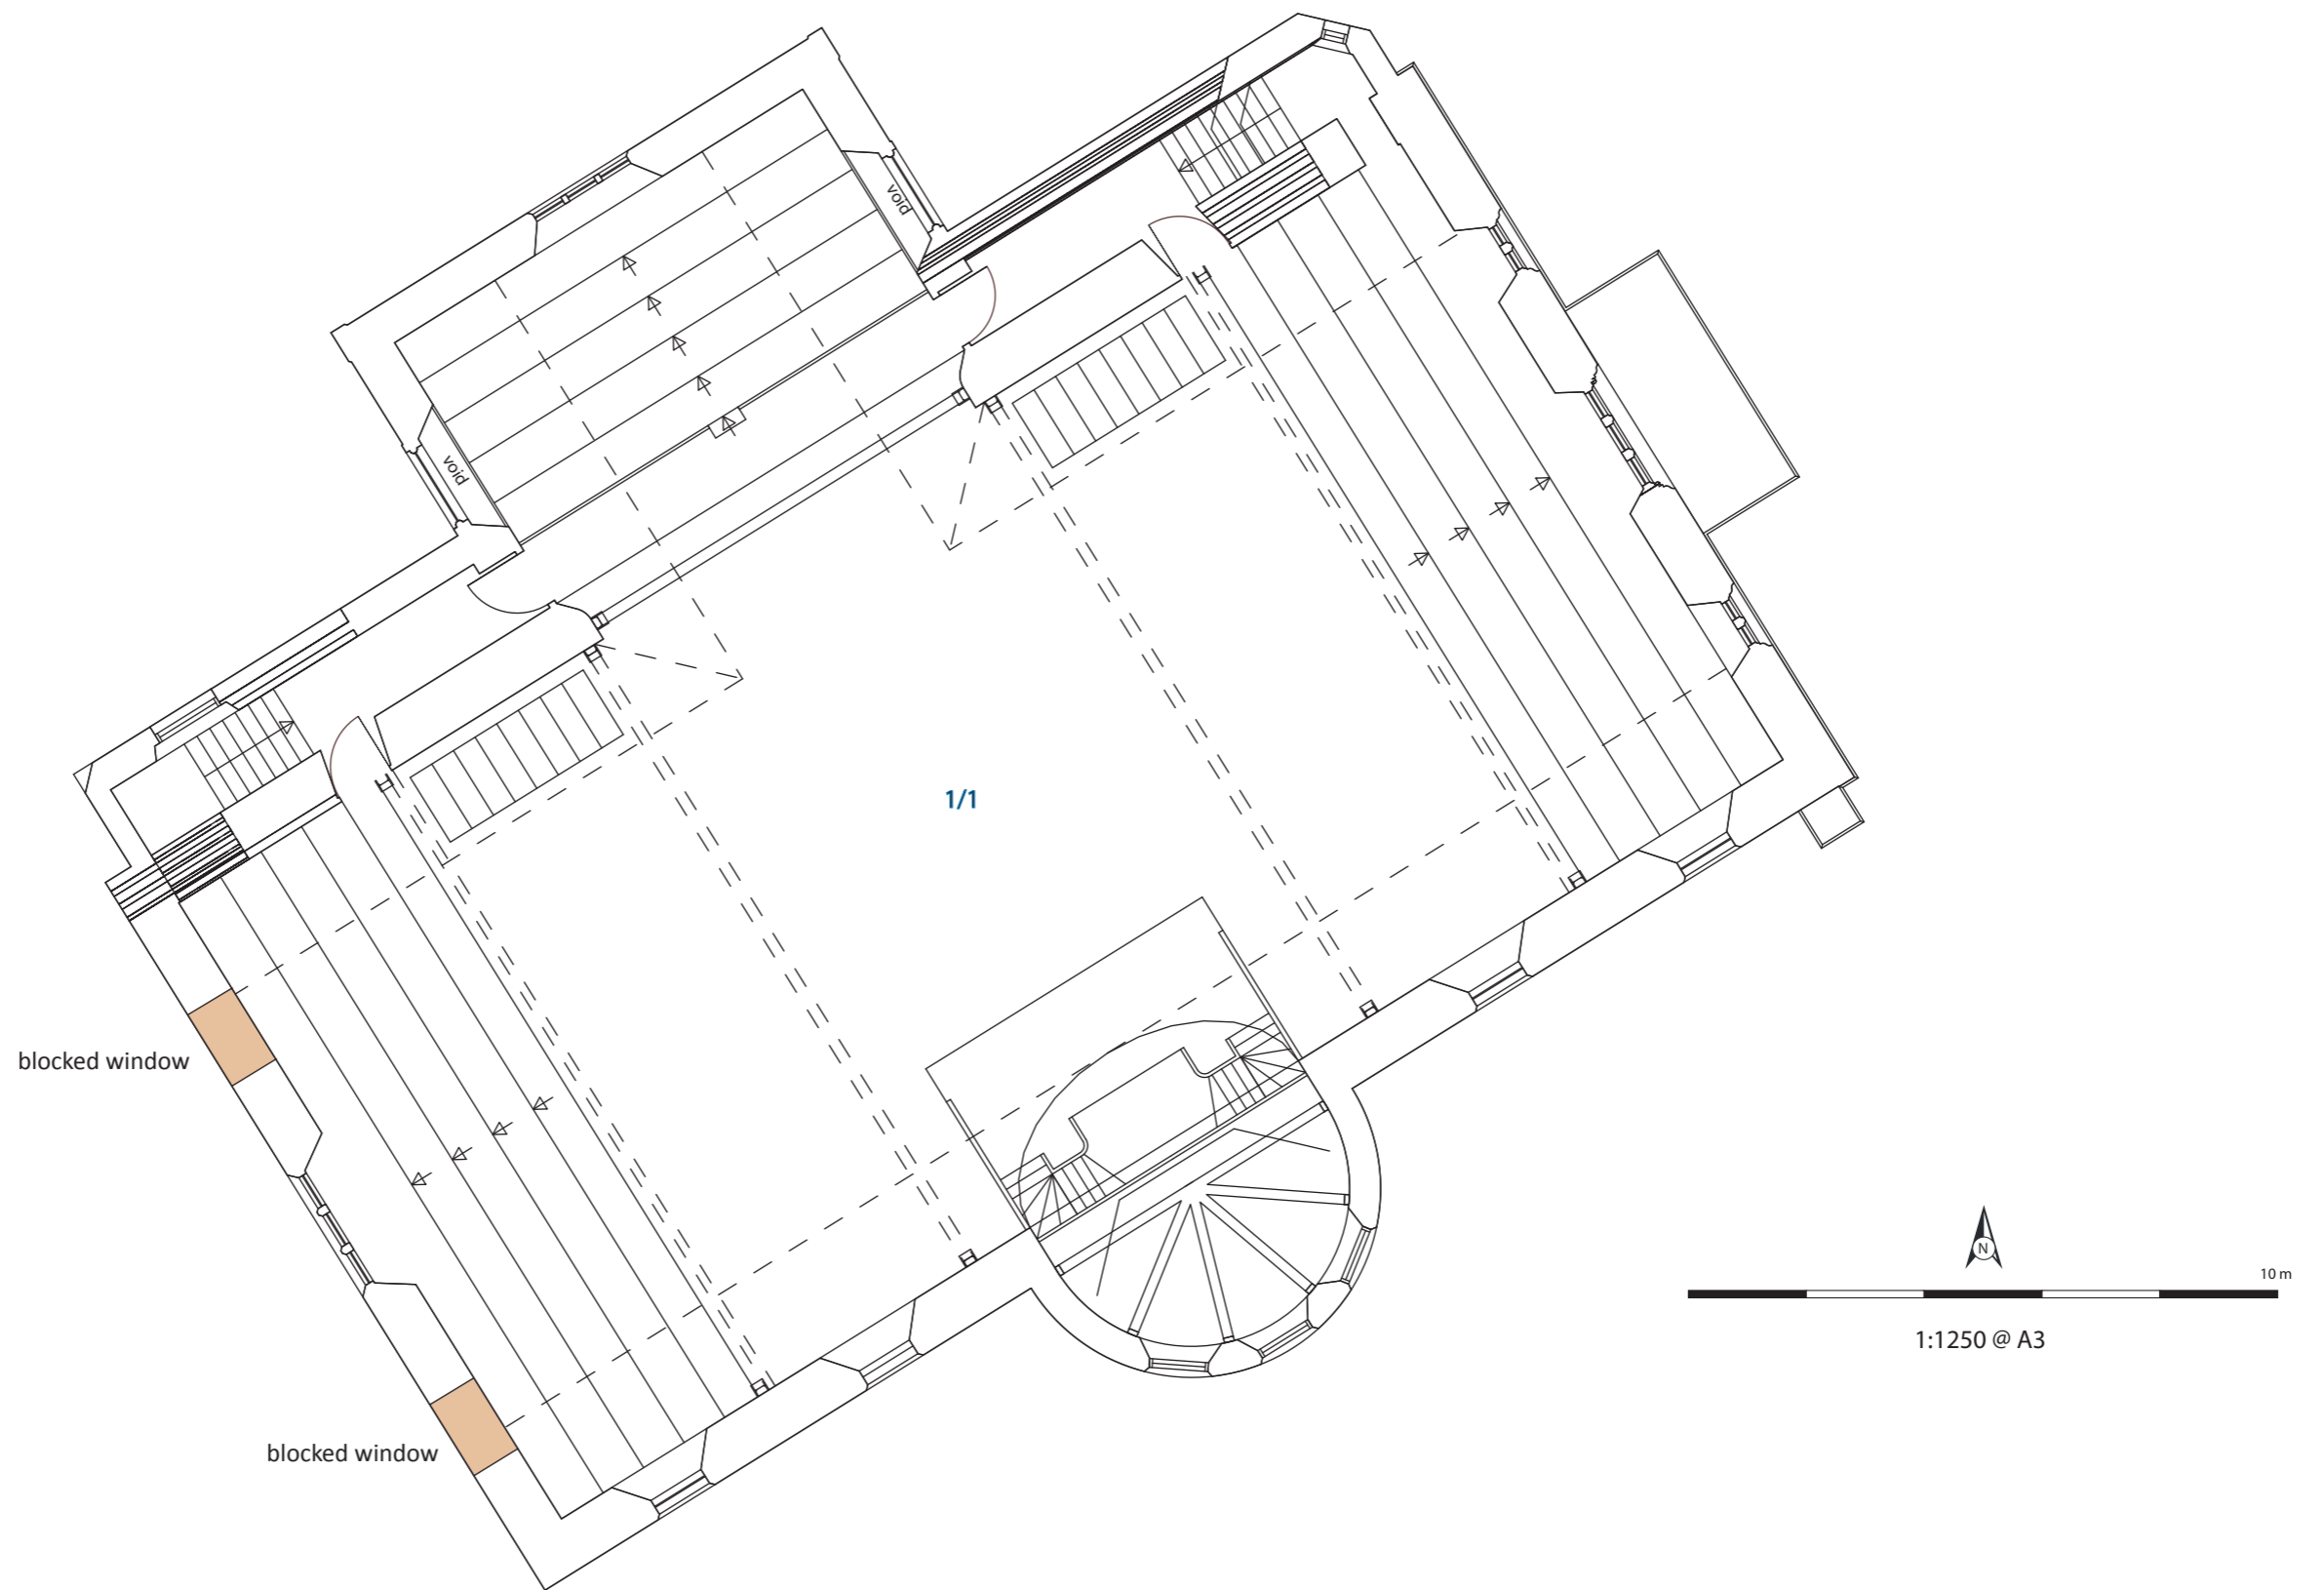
Buccleuch Church, 33 Chapel Street, first floor plan
